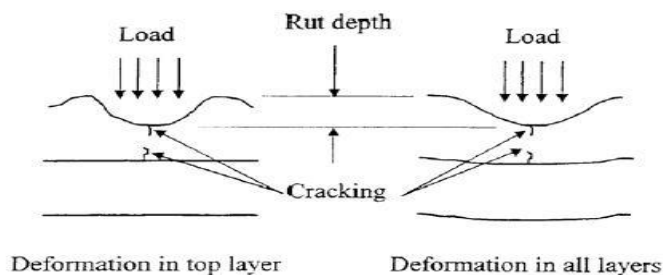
types of failure mechanisms in pavements (COURAGE,1999)
